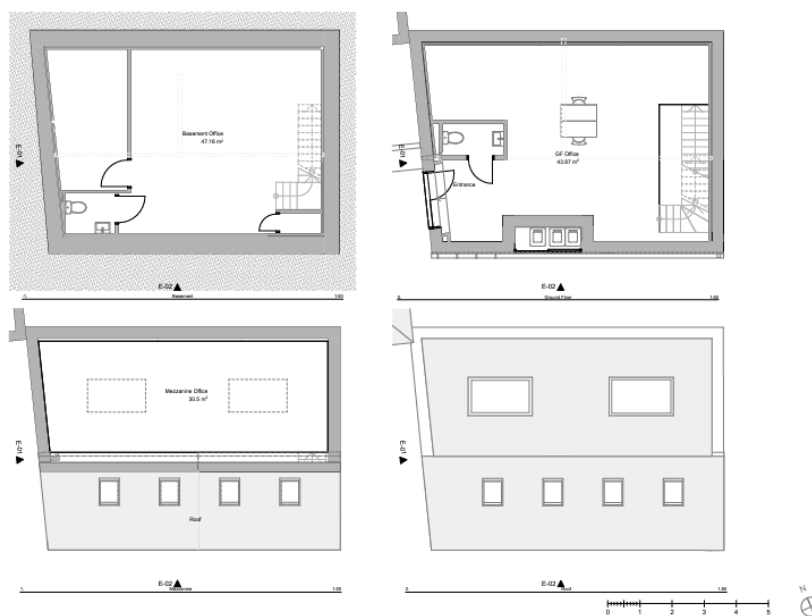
Existing Floor Plans for 36b Rosedale Road
